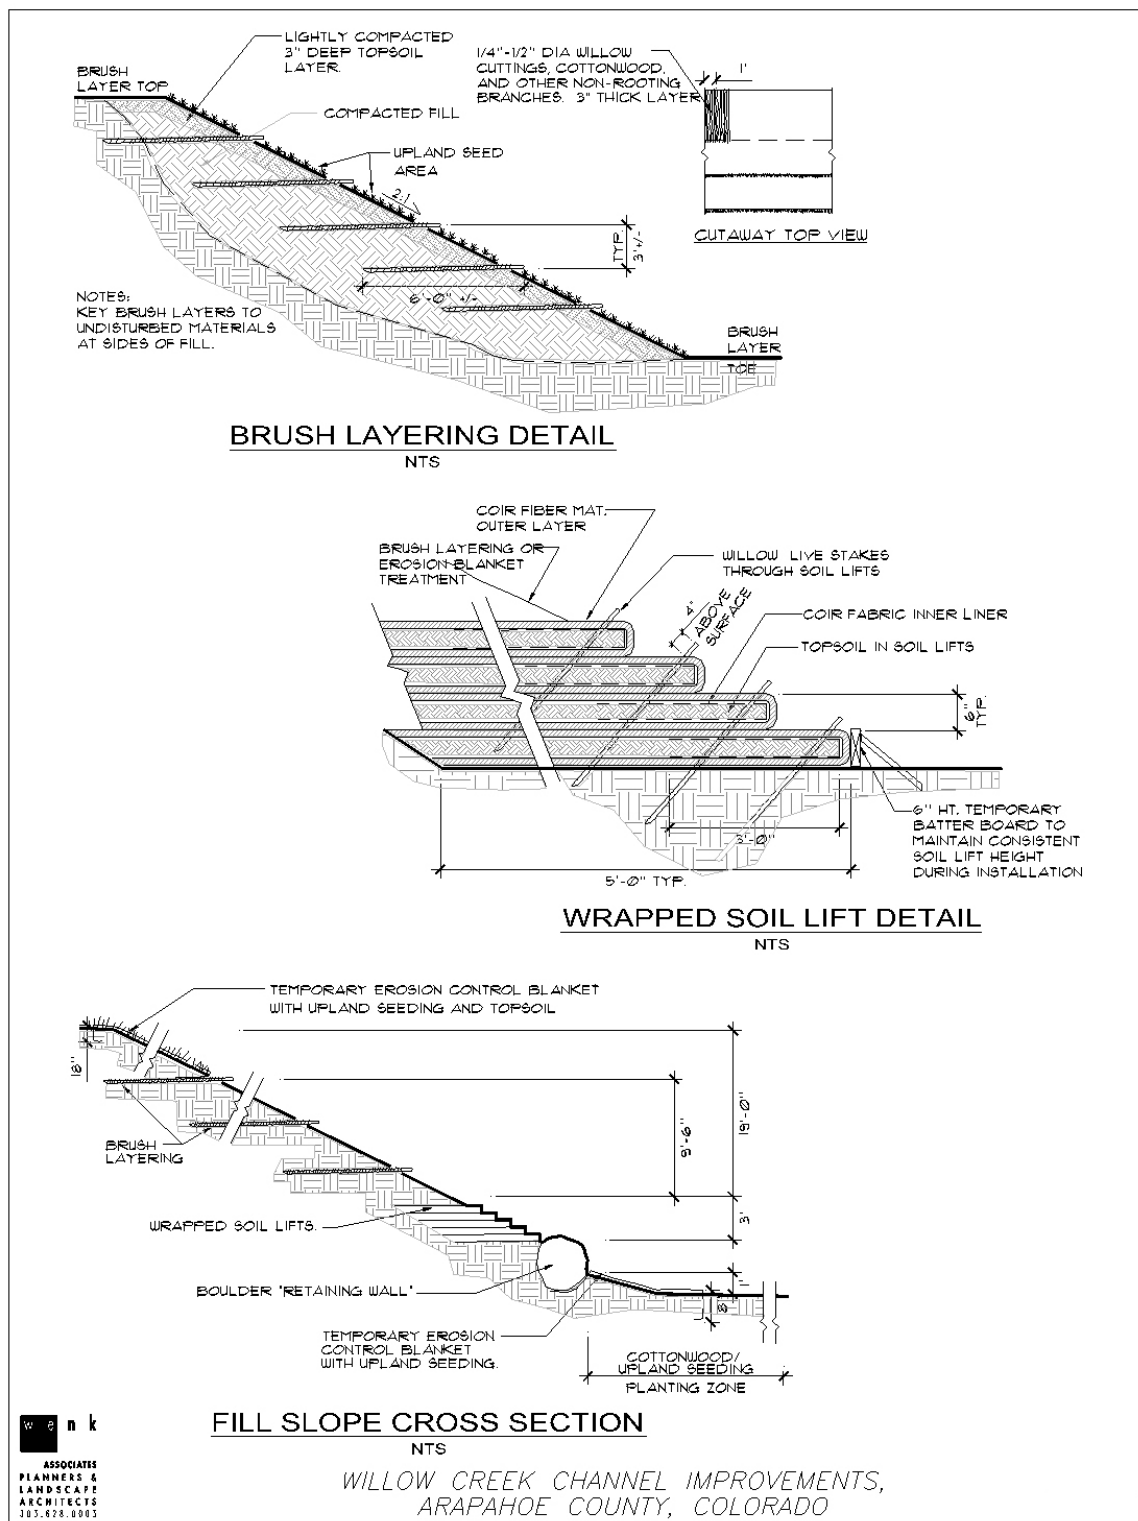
Brush Layering Detail, Wrapped Soil Lift Detail, and Fill Slope Cross Section
